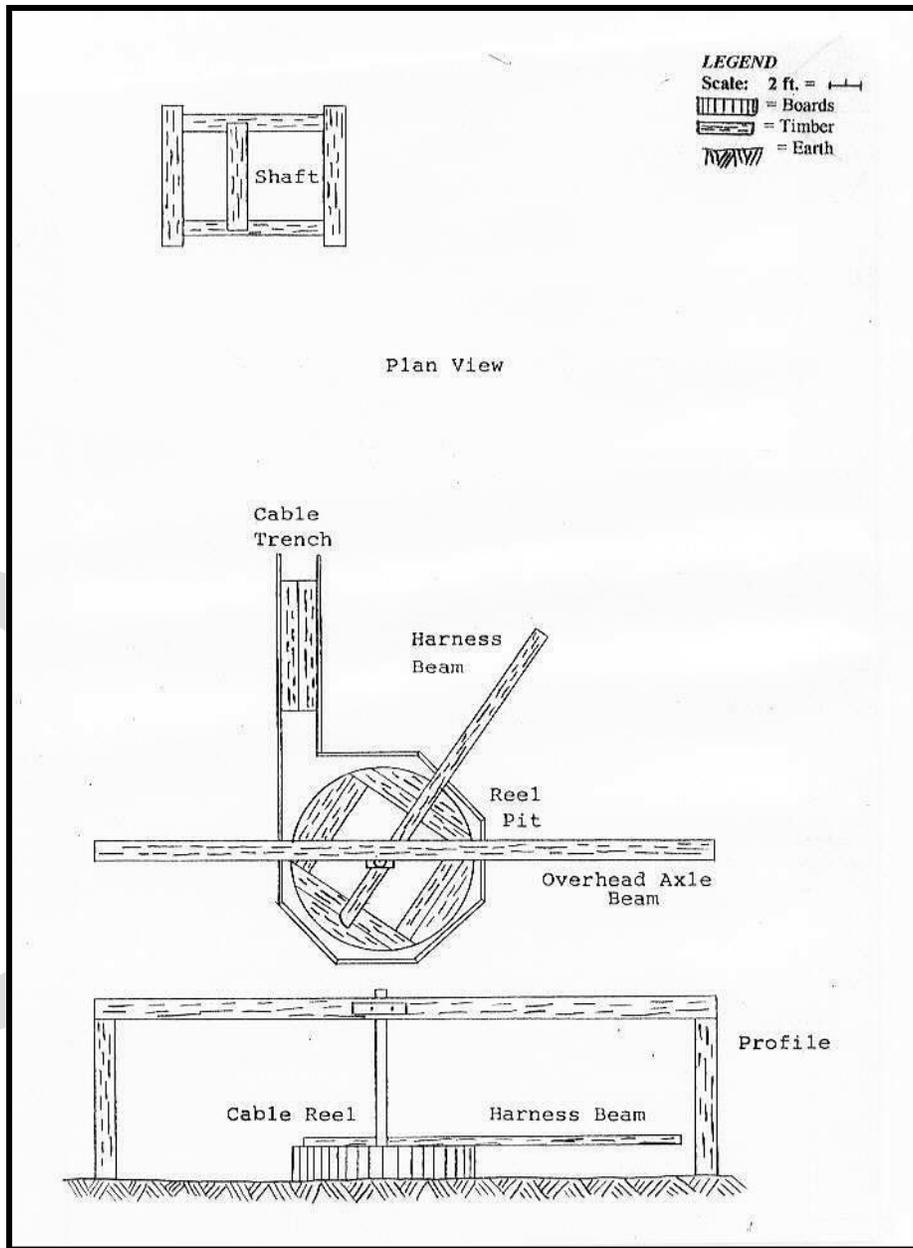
The plan view, top, and elevation, bottom, depict a horizontal reel horse whim, which was a universal prospecting hoist prior to the 1880s. The reel was mounted to an axle on a timber footer buried in the floor of a plank-lined pit. Usually, only the pit and cable trench remain at prospect shaft sites today. Source: Twitty: 2002:158.
